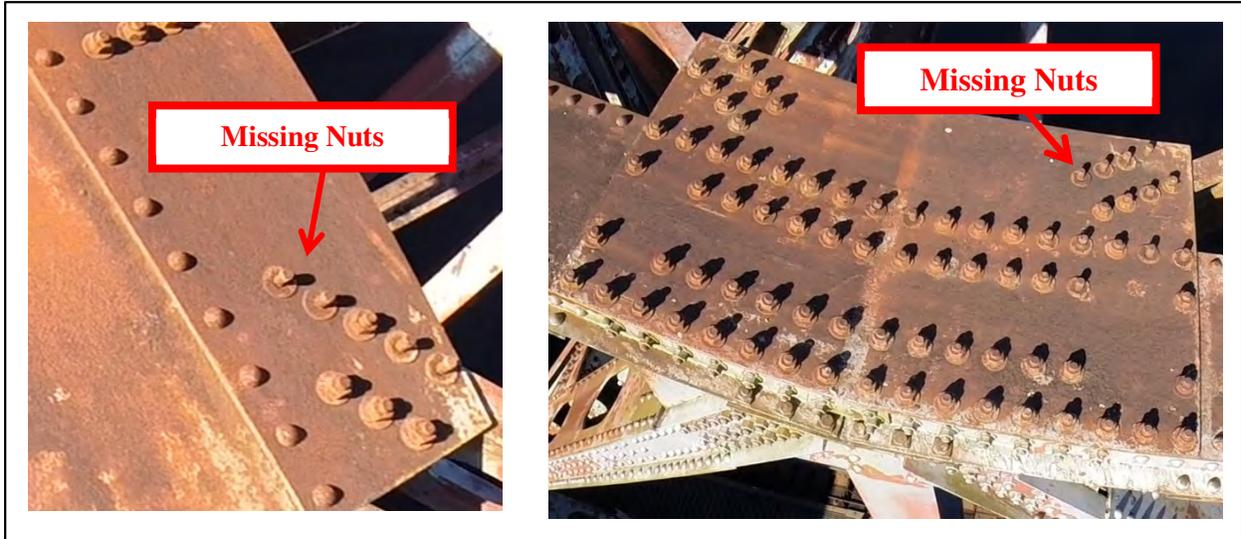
Gusset Plates Located on the Top-Side of the Bridge Showing Defects
